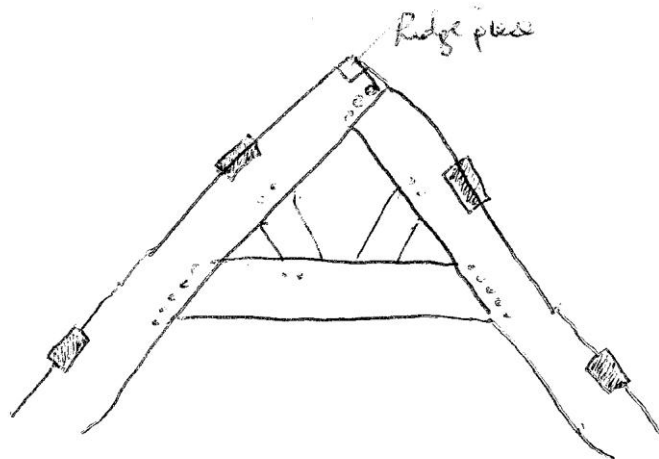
Sketch of the east truss (the west truss has no struts and a higher collar)
